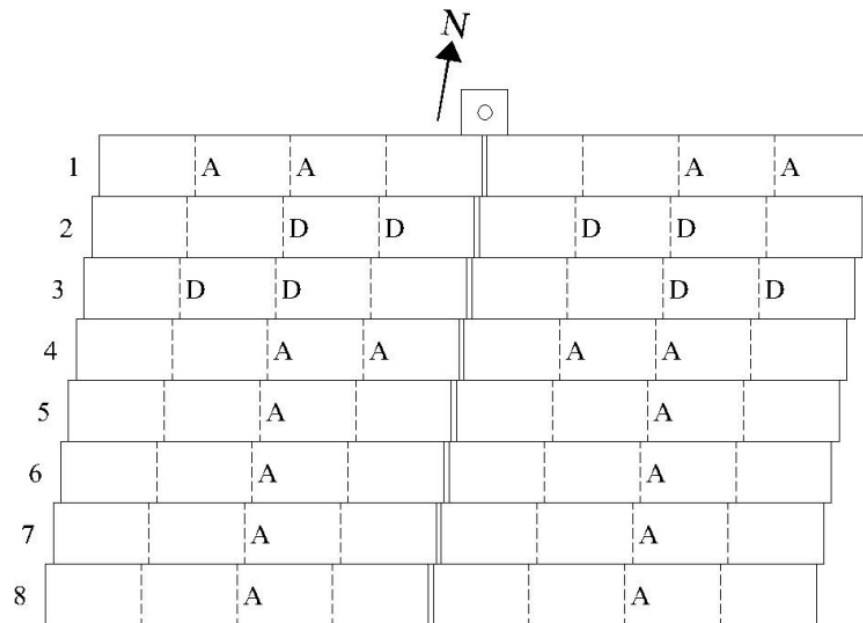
Plan view of instrumentation plan (UHPC Phase III, Figure 9.9)
